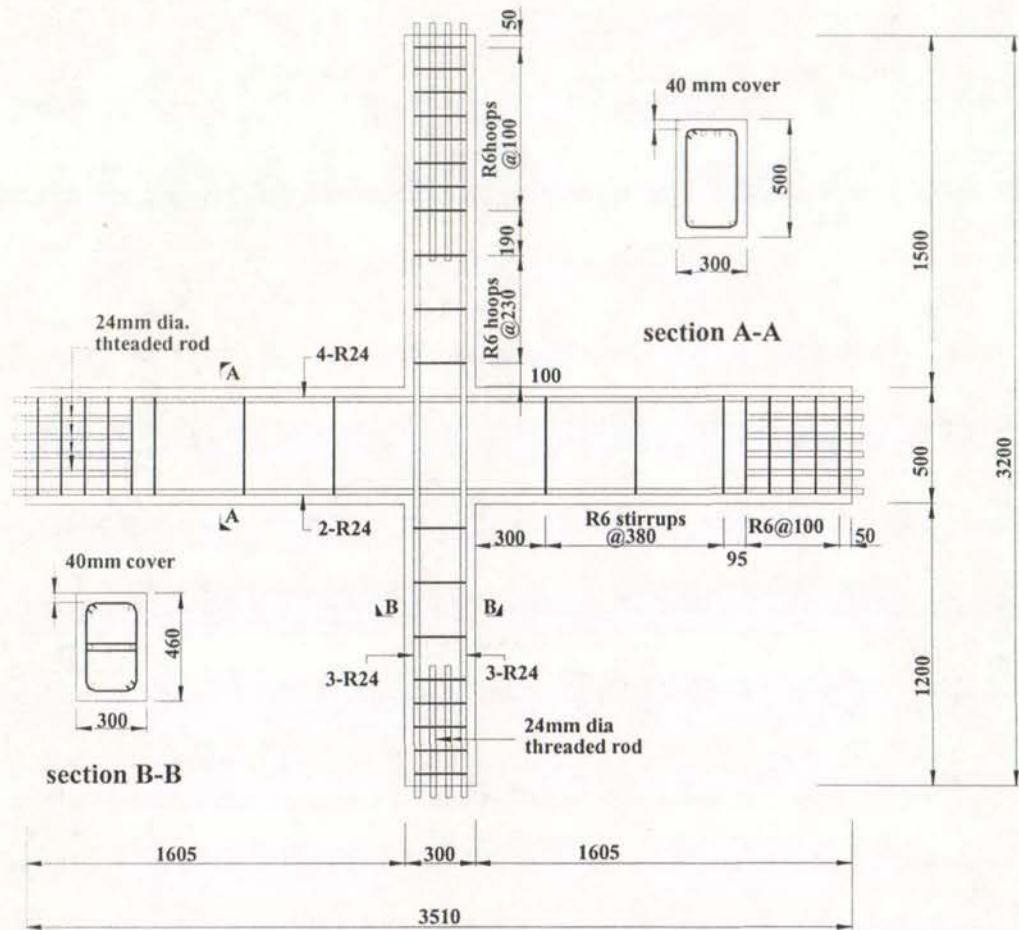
Reinforcement Details of the Two Interior Beam-Column Joint Specimens
